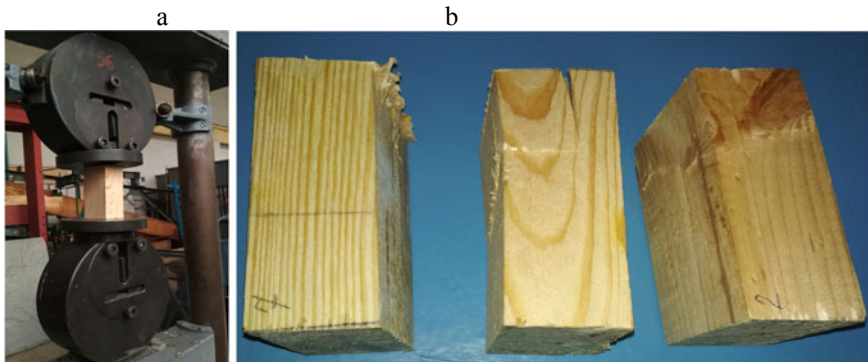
a–Layout of the wood compression test; b–Layout of test specimens after destruction
